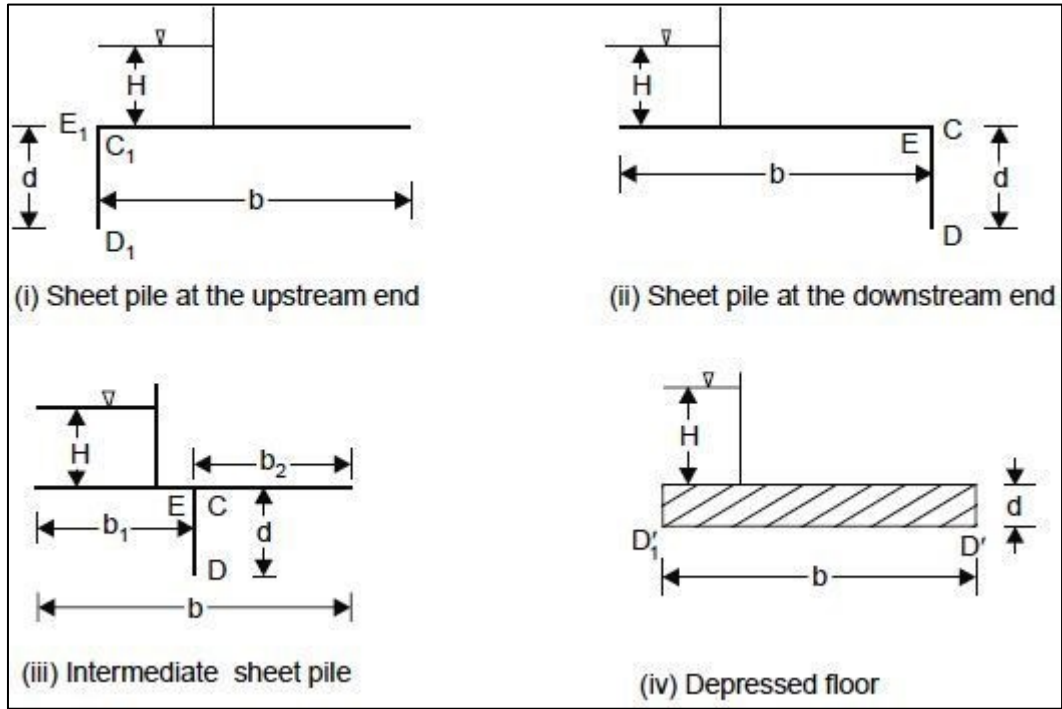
Simple Standard Profiles of Weir Floors of Khosla's proposals
